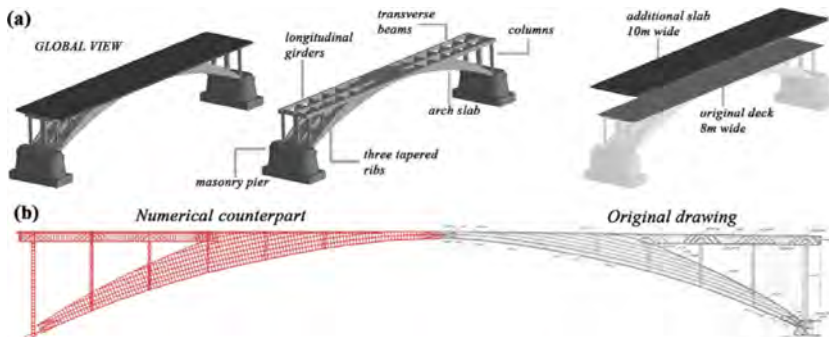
(a) AEM model of a single bridge span, with the nomenclature of main constituting components, and (b) comparison between original drawing reinforcement details and numerical counterpart.
